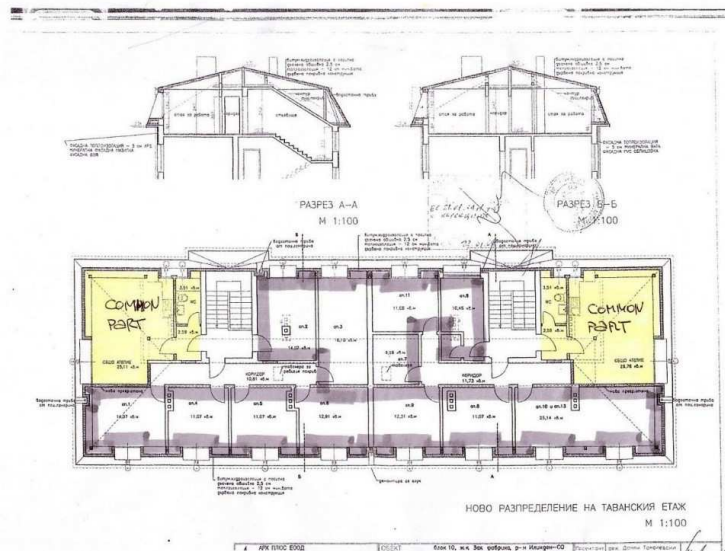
Project for the reconstruction of the under-roof space of the pilot building. Source: G. Georgiev – private archive
